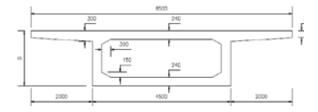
Cross-sectional dimensions of Rectangular Box Girder
